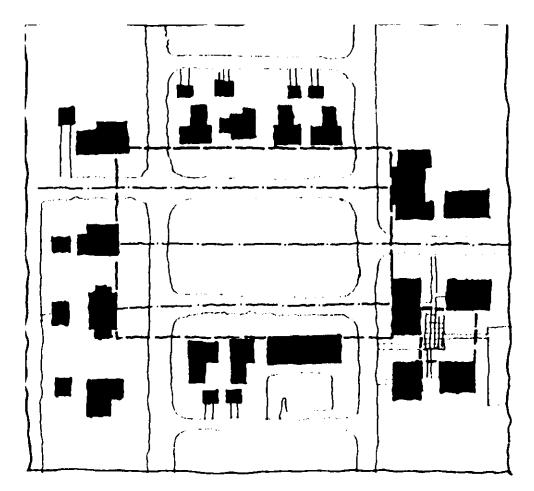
Spaces framed by buildings should be geometrically logical and/or architecturally formal.
